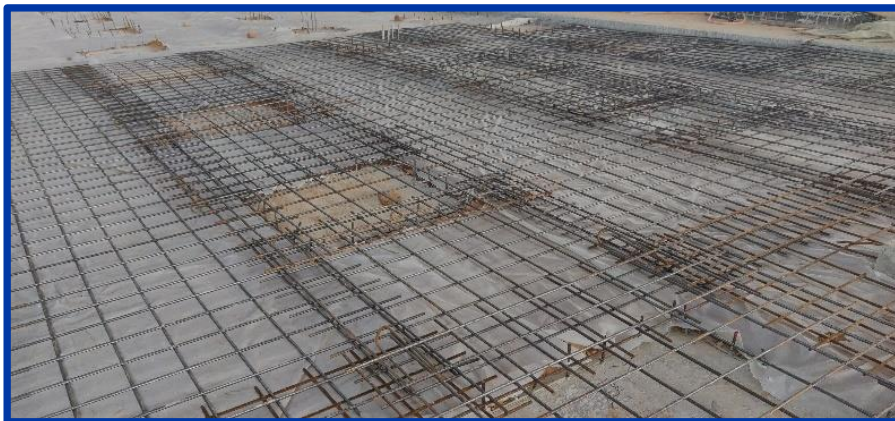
SSM Fabric can be used for reinforced concrete slabs which also includes conversion of large diameter steel bars into SSM Engineered Fabric to expedite site progress.
